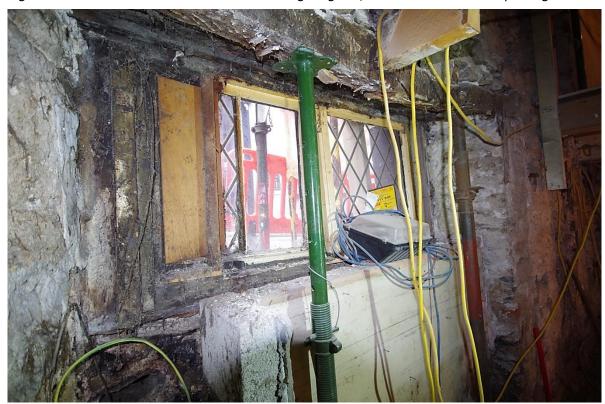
Ground floor north-west wall showing original window opening at south-west end.
